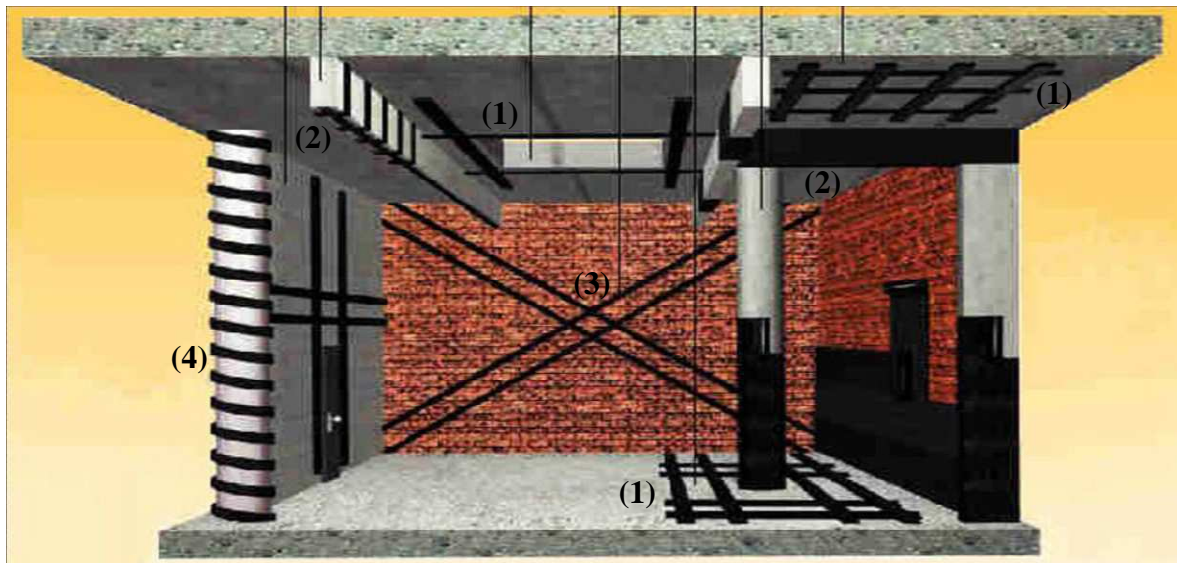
Typical applications of FRP in the strengthening of RC structures.
